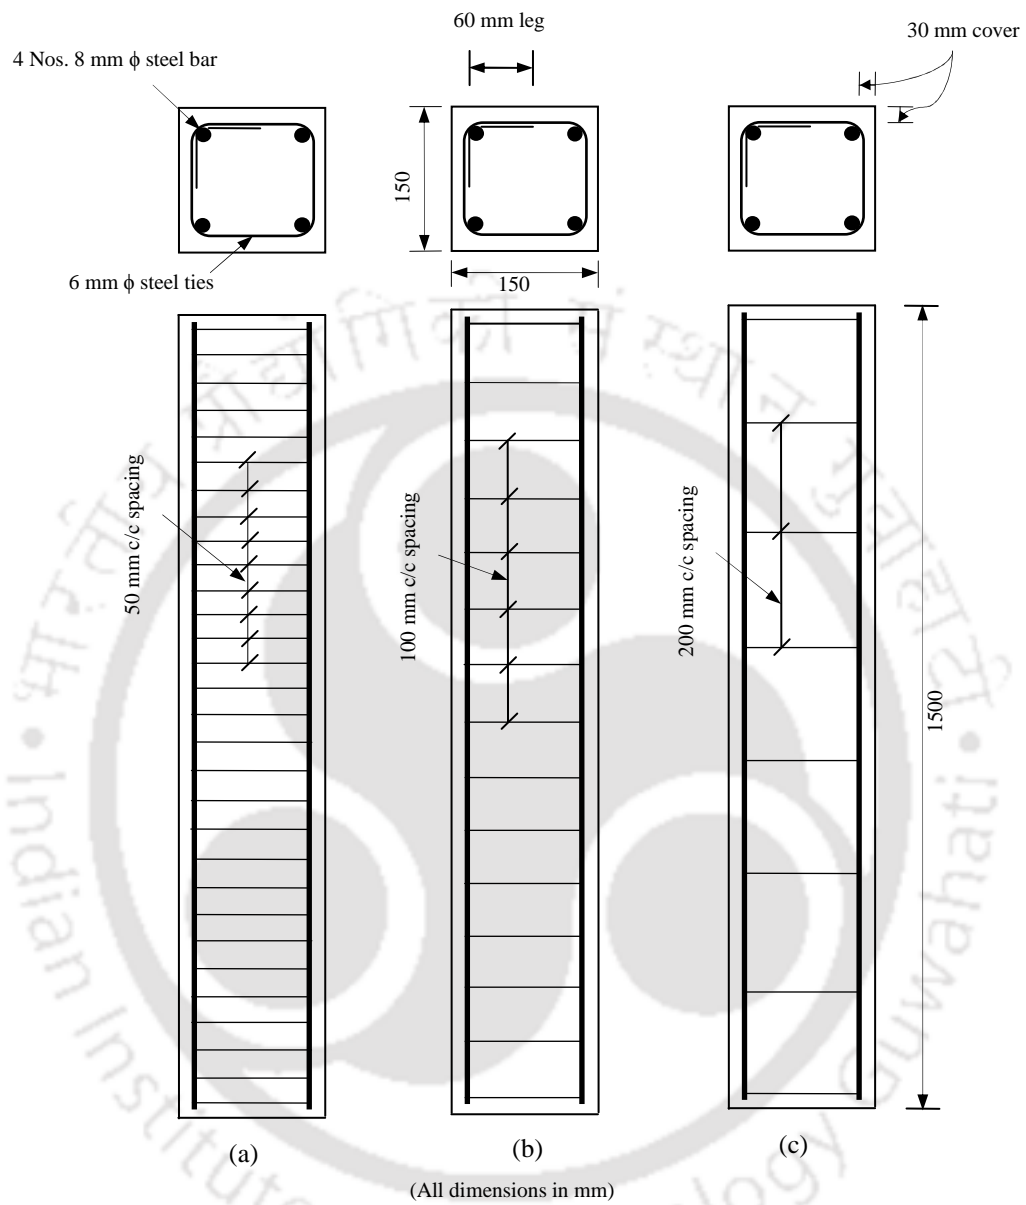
Reinforcement details of column with tie spacing: (a) 50 mm; (b) 100 mm; and (c) 200 mm.
